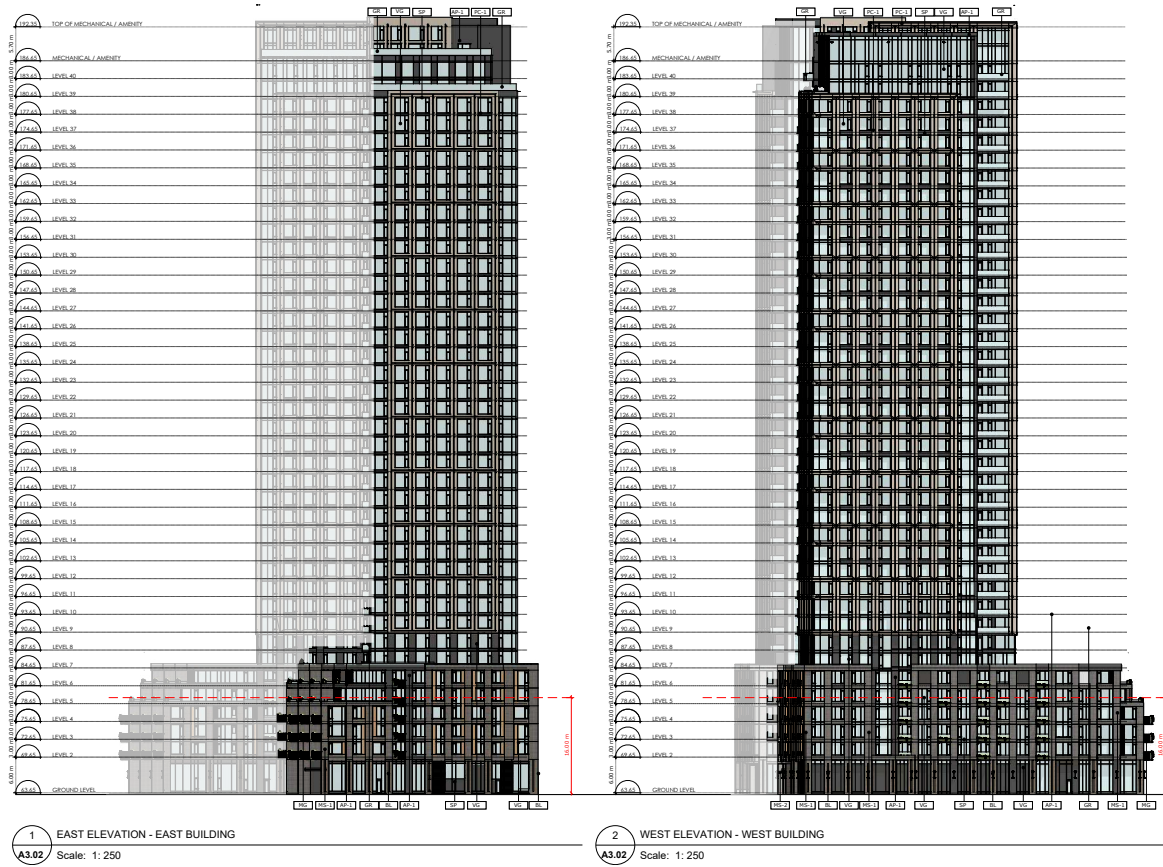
East Building East Elevation + West Building West Elevation.
